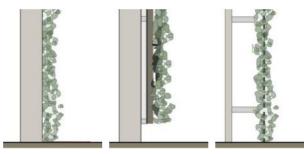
Green Wall Installation Typology Non-ventilated Wall (left), Ventilated Wall (center), and Double-Skin Façade (right) Source: Living walls in indoor environments [26]
